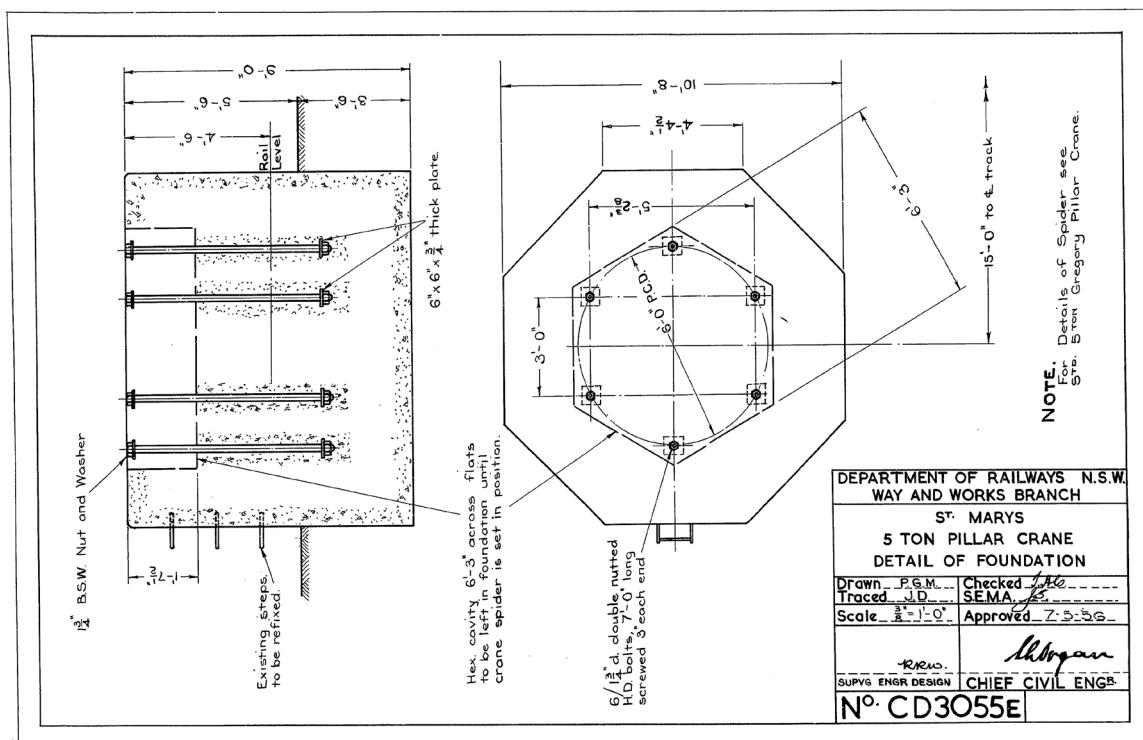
Sydney Trains plan showing St Marys Pillar Crane foundation, 1956. Source: Sydney Trains Plan Room<sup>33</sup>
